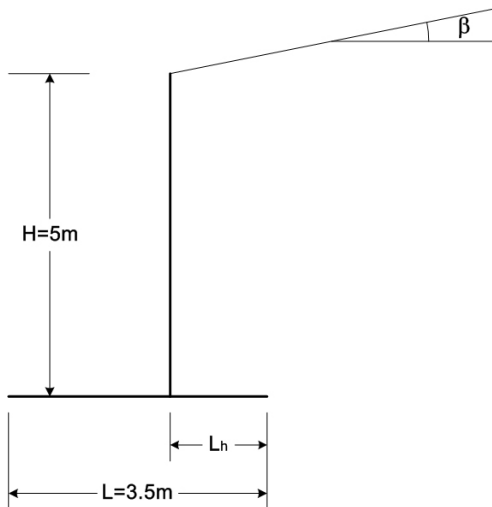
Modelling of cantilever wall for estimation of slope angle of failure plane
